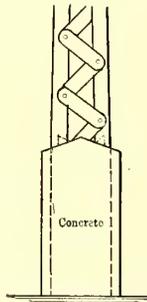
METHOD OF PLACING CONCRETE ABOUT BASE OF LATTICED POLE
